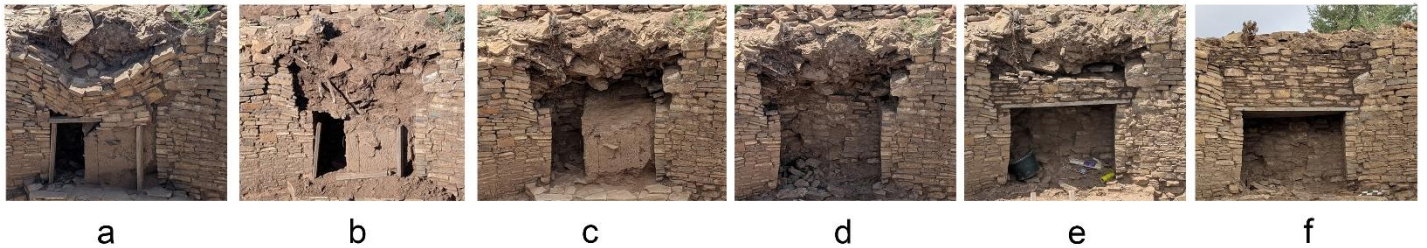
Kiva 32 Feature 1 excavation and stabilization sequence. a) clearance of fallen masonry; b) removal of slumped masonry; c-d) excavation to clear room for reconstruction; e-f) reconstruction.
